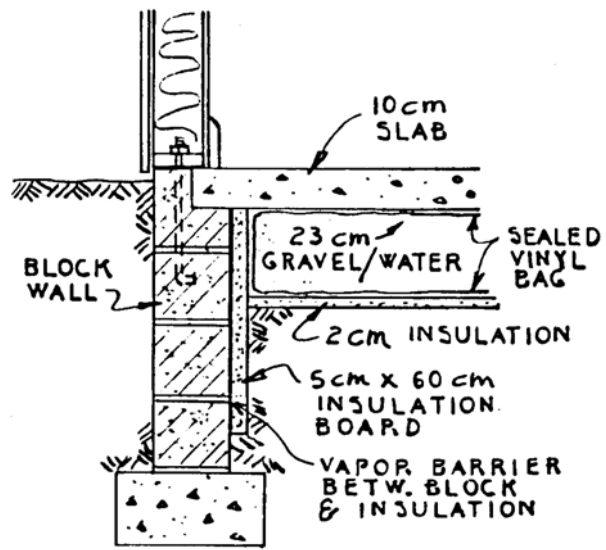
DETAIL OF RESIDENTIAL FLOOR STORAGE SYSTEM
